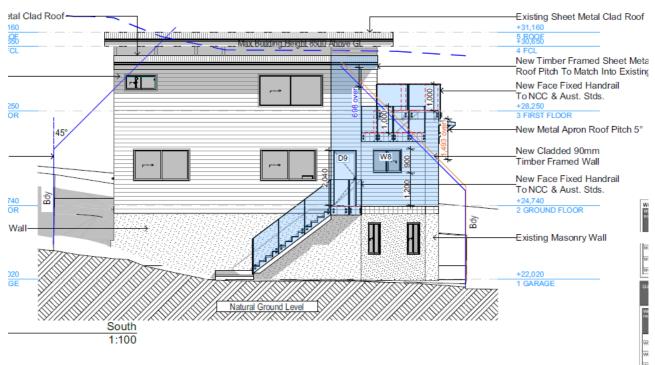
Southern elevation with ground floor encroaching the side boundary envelope (original plans)
